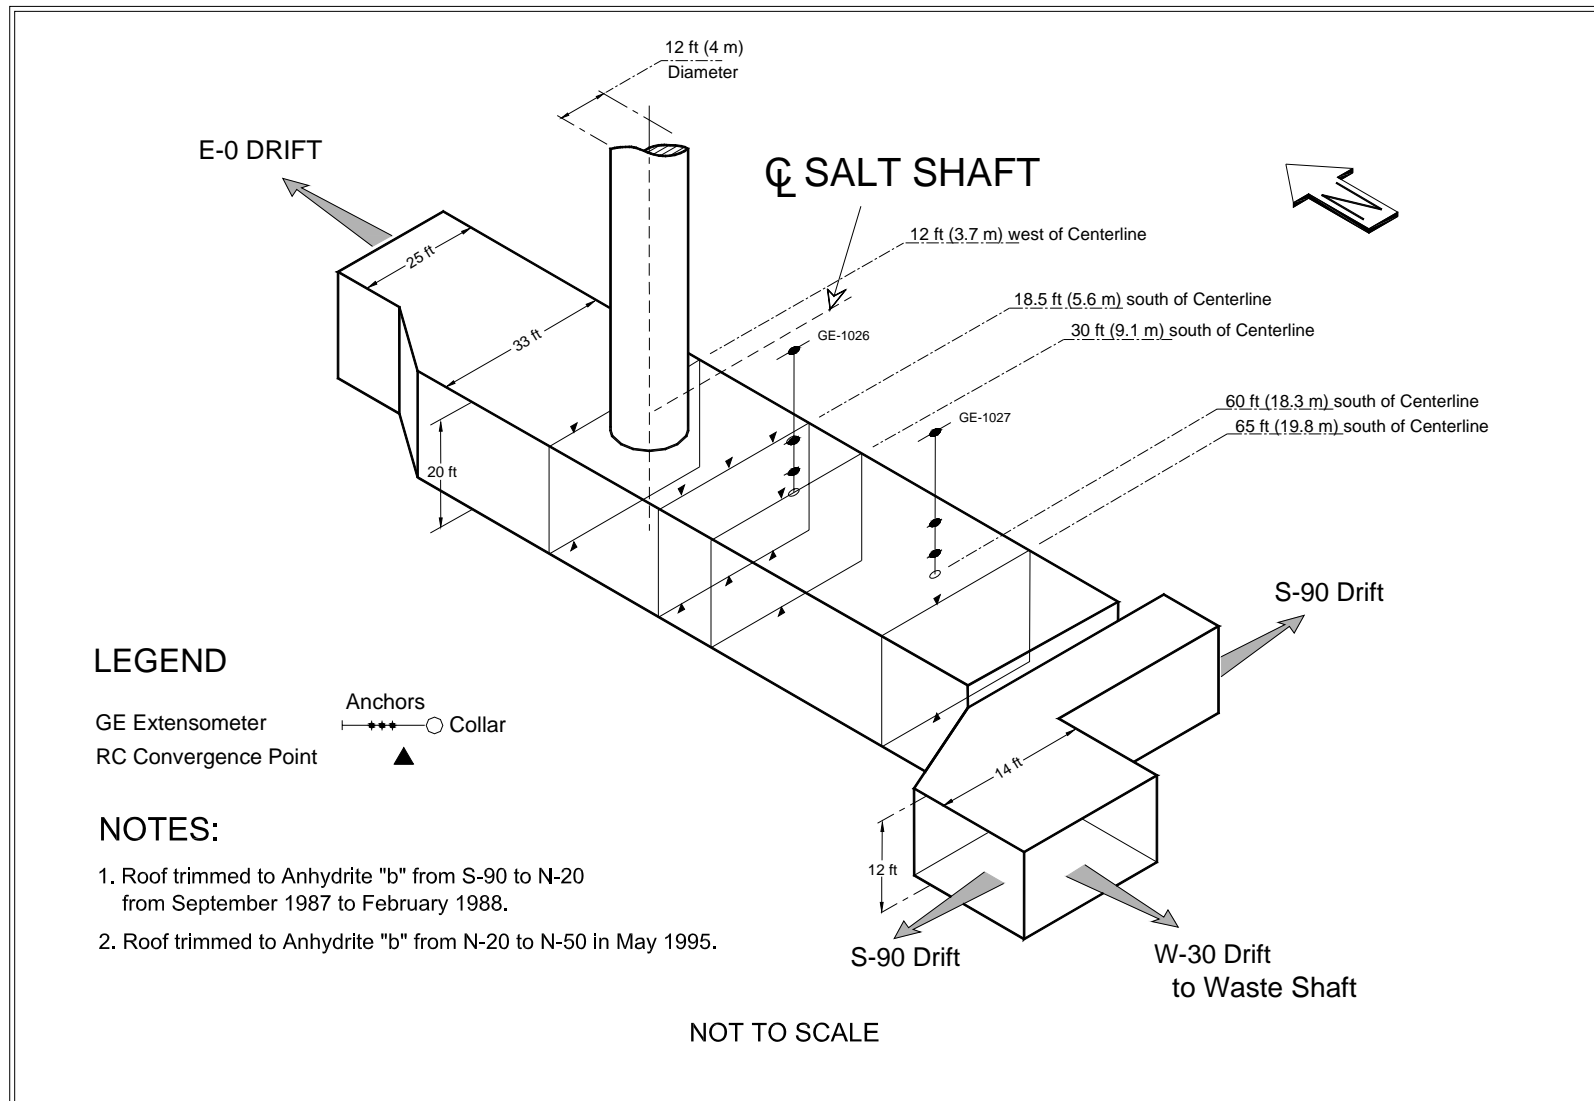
Salt Shaft Station Instrumentation After Roof Beam Excavation
